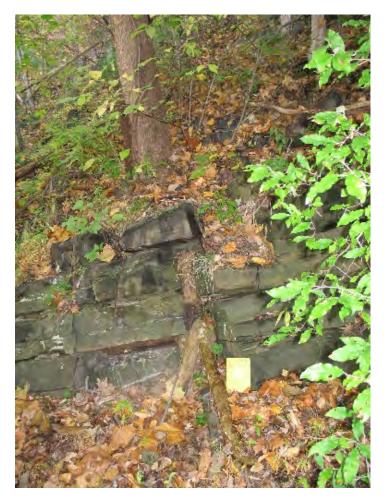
Example of Root Wedging (Toe of Slope, Area D, Looking Northeast)
